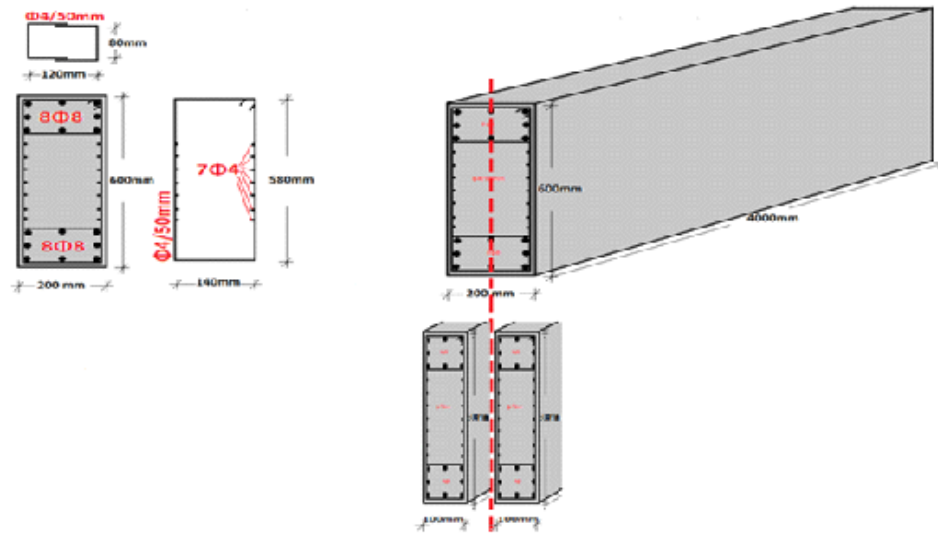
Shape and reinforcement of a conventionally reinforced wall.
